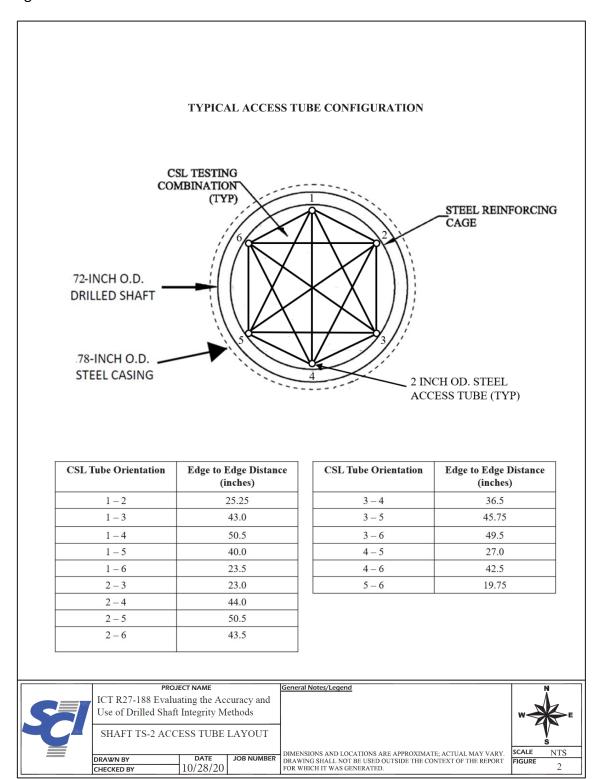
Illustration. CSL access tube configuration for test drilled shaft #2.
